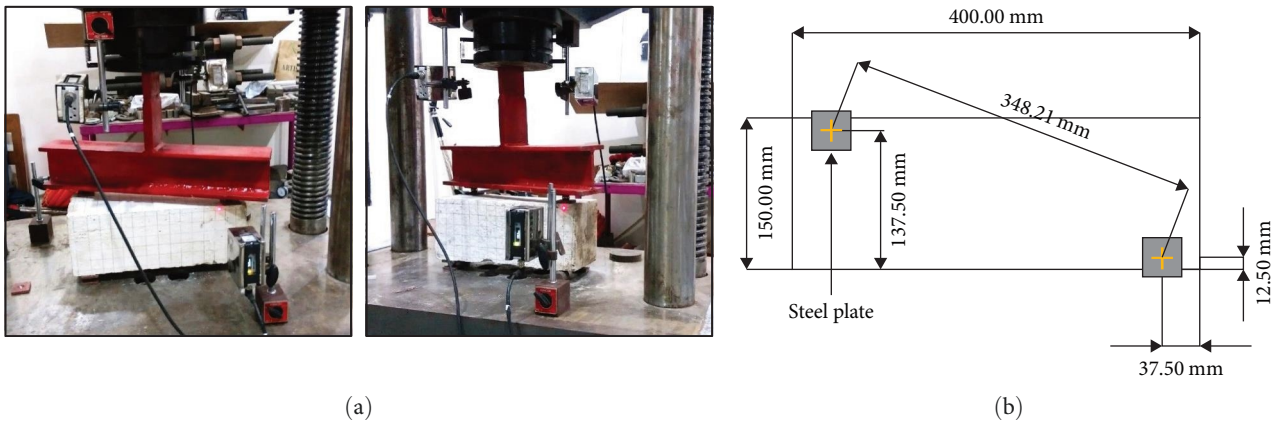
Configuration of torsional test setup (a) beam loaded with steel I joist and (b) steel plate attached at top and bottom surface to support spherical balls.
